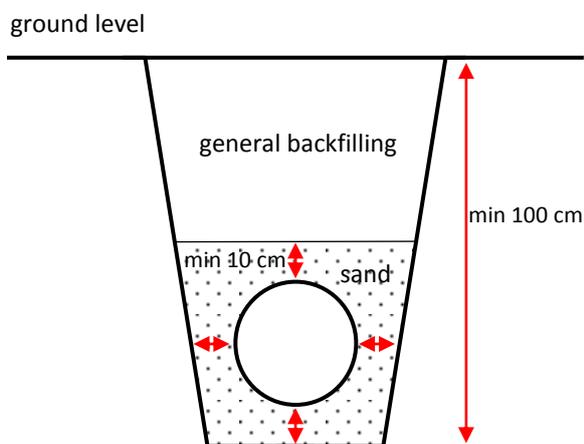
The pipeline should be installed with care. The trench should be at least one meter deep. The pipe itself should be embedded by a layer of sand which should be at least ten centimeters thick. As a 22.5 cm wide pipe is recommended, the trench should be at least roughly 45 cm wide at the bottom. The sand embedment shall be covered by general backfilling. The backfilling should be done stepwise. After adding a layer of roughly 20 cm the layer should be compacted well before the next layer is added.
